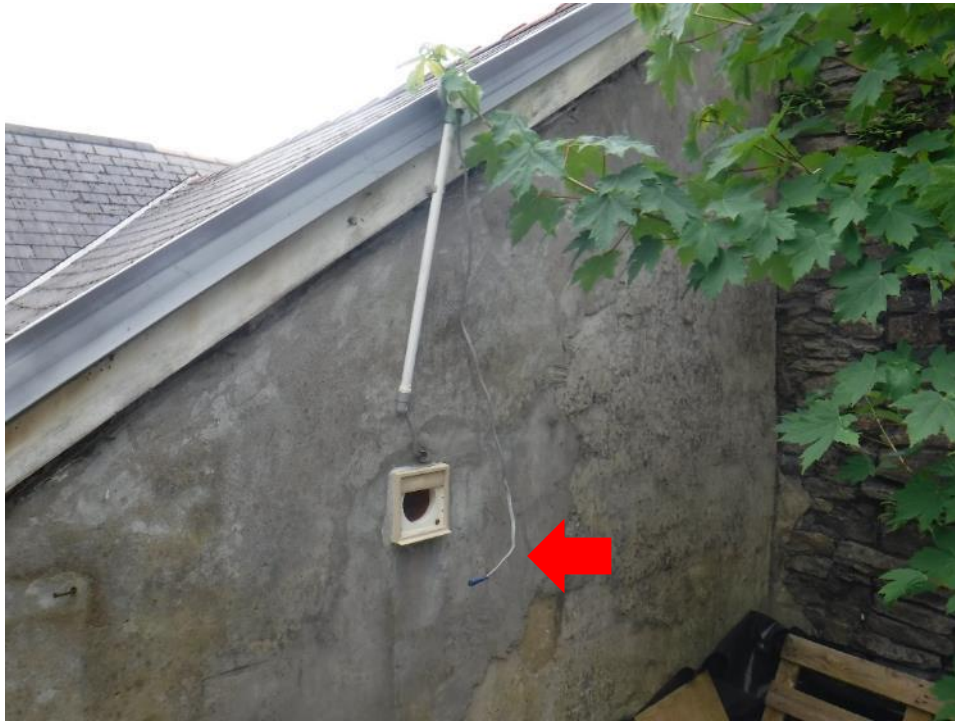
Sink in the second bedroom outlet (above kitchen door)
